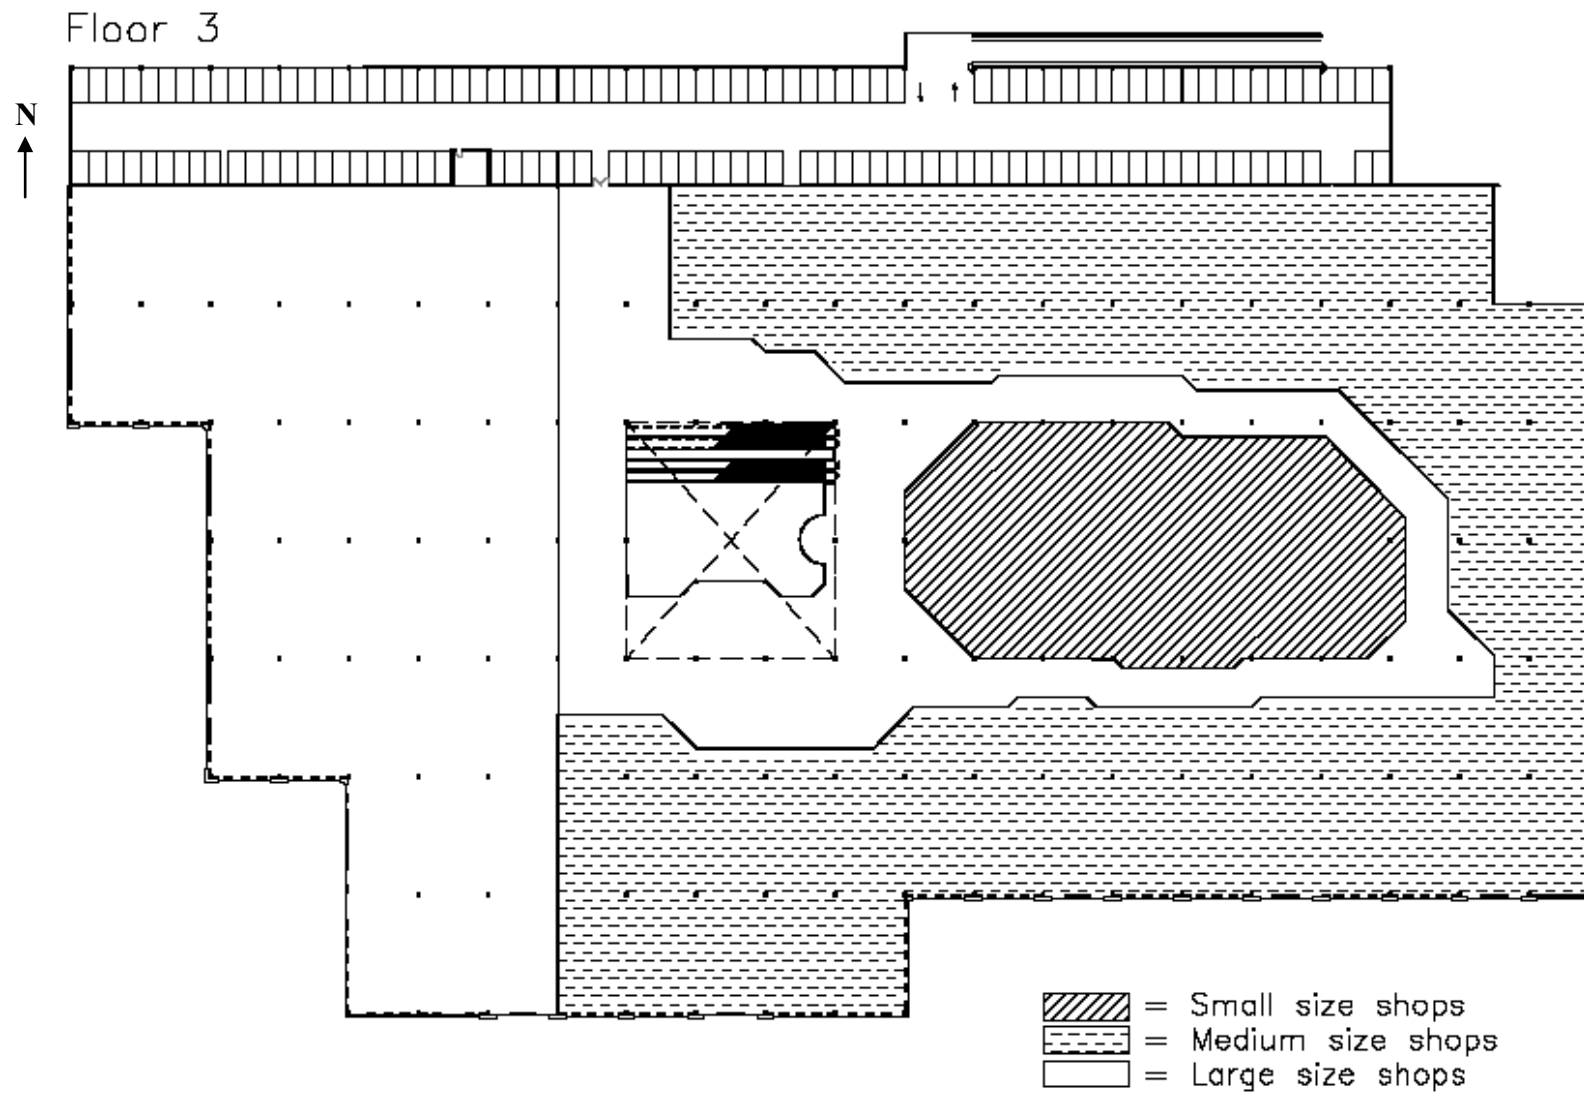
Original Shopping Mall Building Plan – Floor 3
